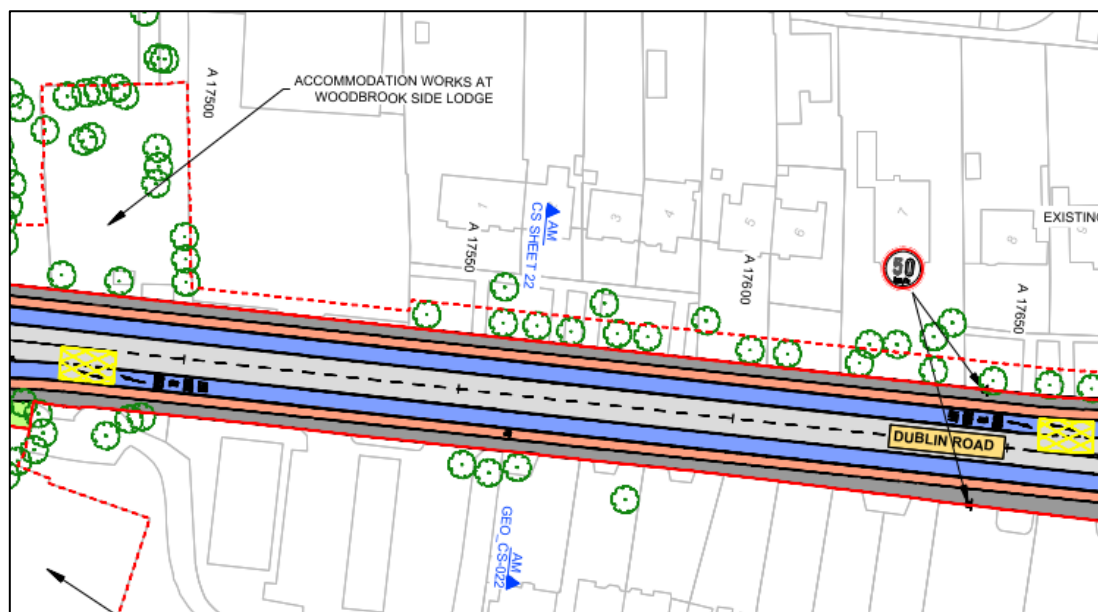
Extract from General Arrangement Drawing at Dublin Road (Sheet 50)
